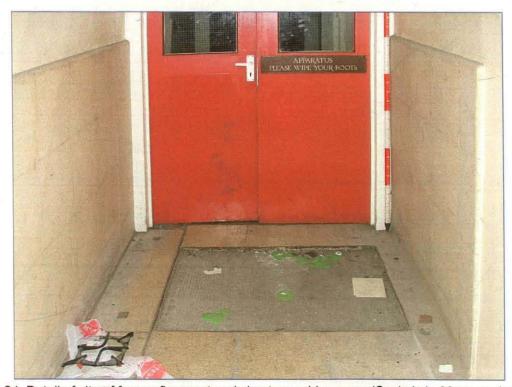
Detail of site of former floor mat and sign to machine room (Scale is in 20cm graduations)
